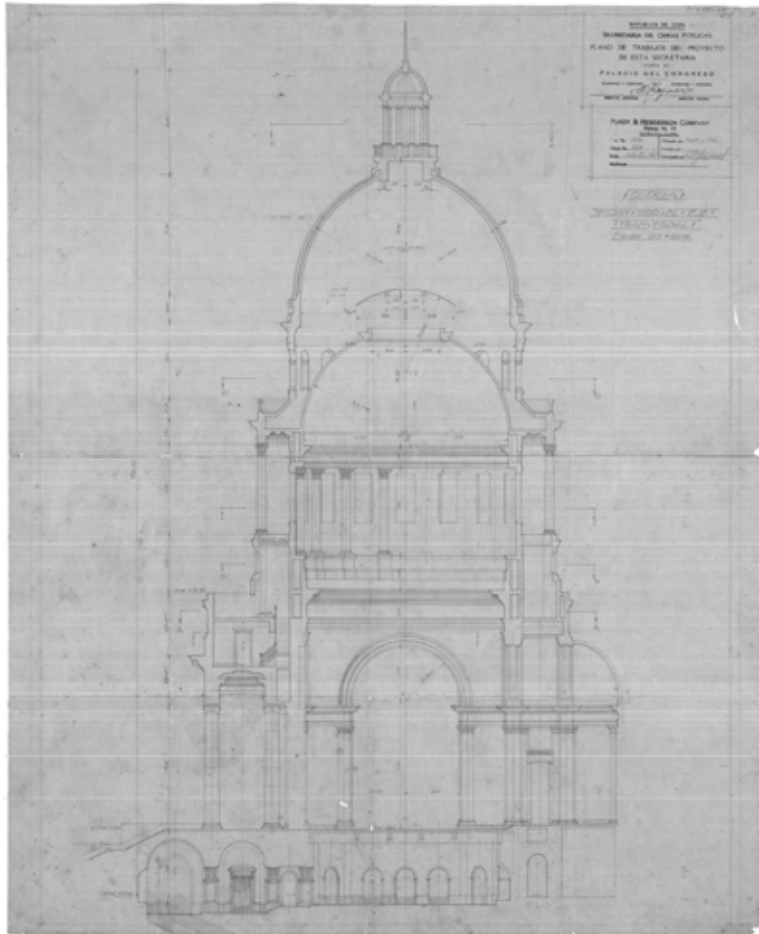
Dome final drawing, by the Arch. Eugenio Rayneri Piedra. As it can be seen, only the desirable shape of the dome is specified. Internal structure does not appear, as it will be later designed by Purdy & Henderson. Source: *Hand-drawn plans of the Capitol Building*.
